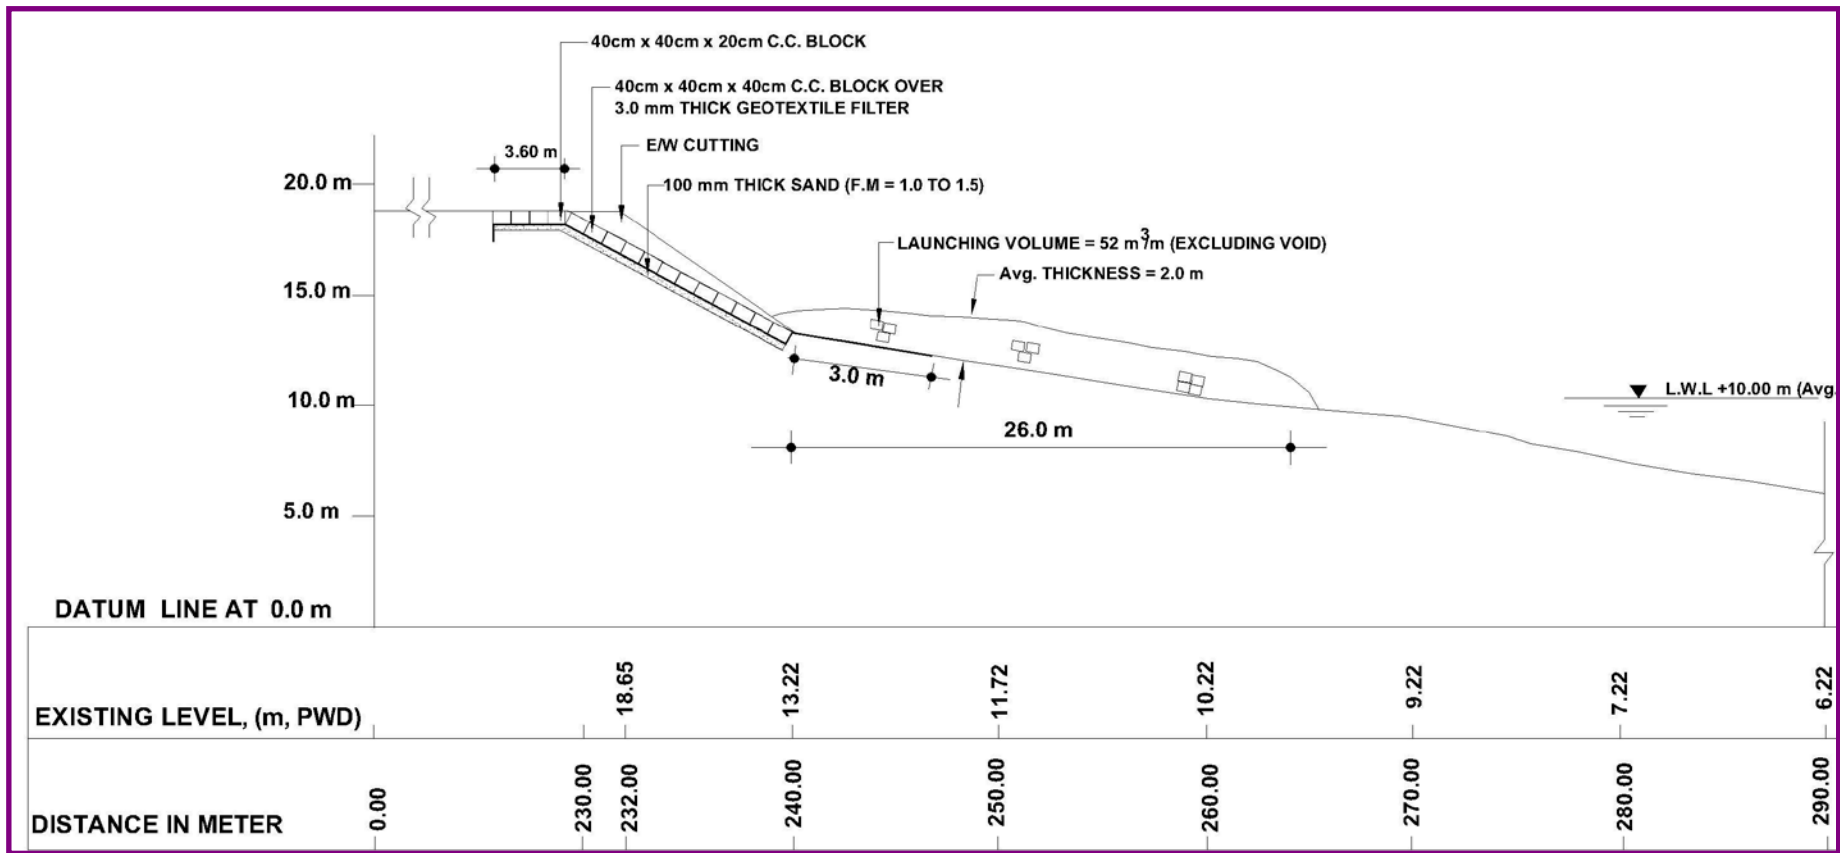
Typical Design Section of Titporol Revetment drawn at Km. 17.00 (C/S No. 20)
